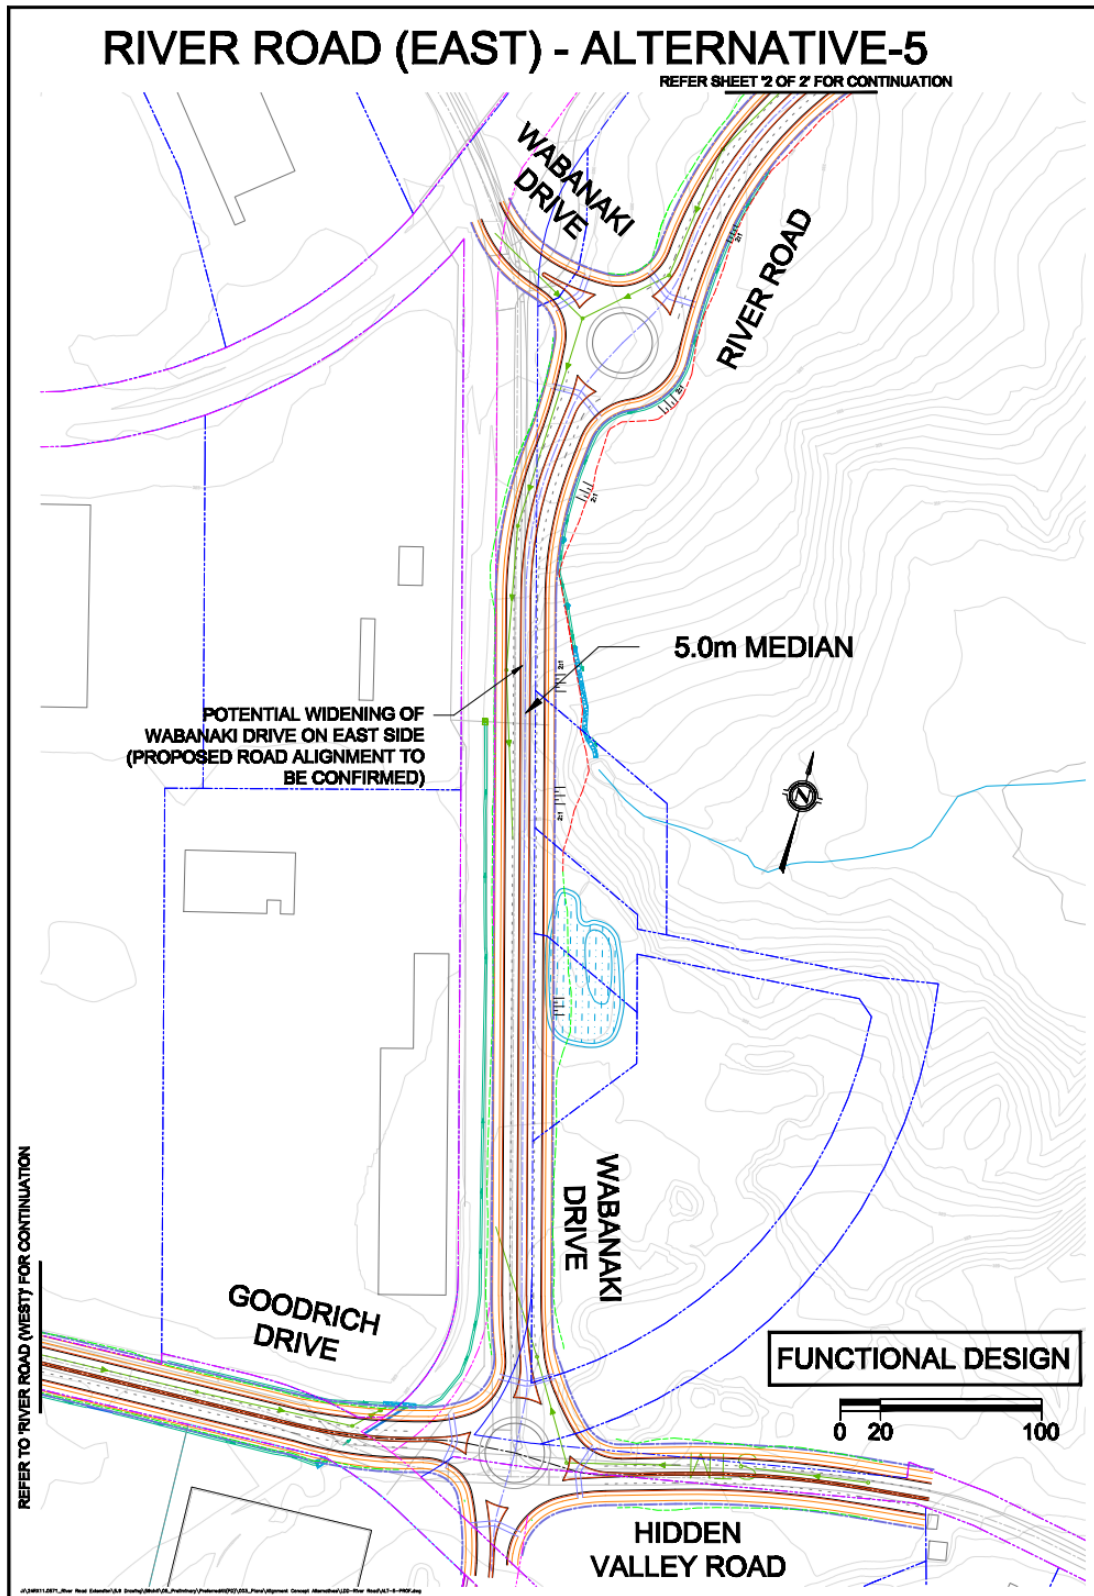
3: River Road Extension Design Concept Wabanaki Drive to Goodrich Drive (L-3)
